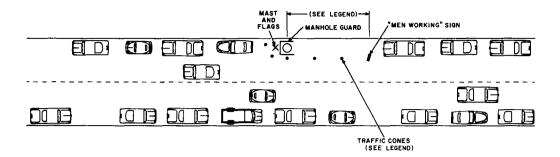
Placement of Warning Devices on City Street Without Truck—Underground Plant at Side of Street
